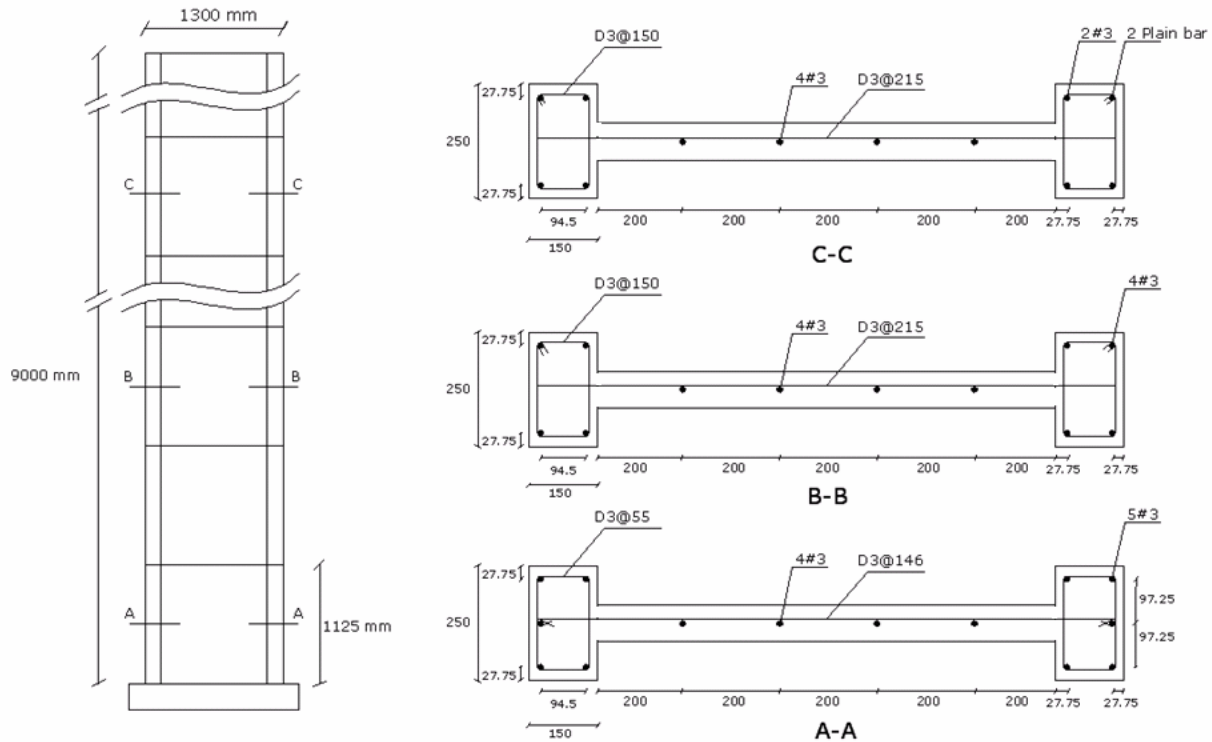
Elevation and section views of the model wall (mm) (section views are not scaled)
